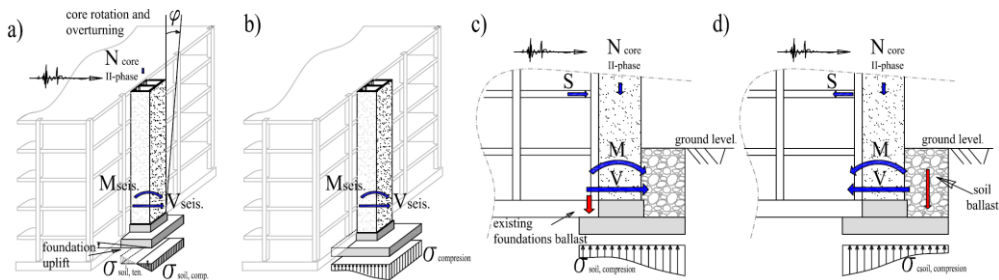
Strengthening with RC core or individual walls beyond the structure's perimeter
